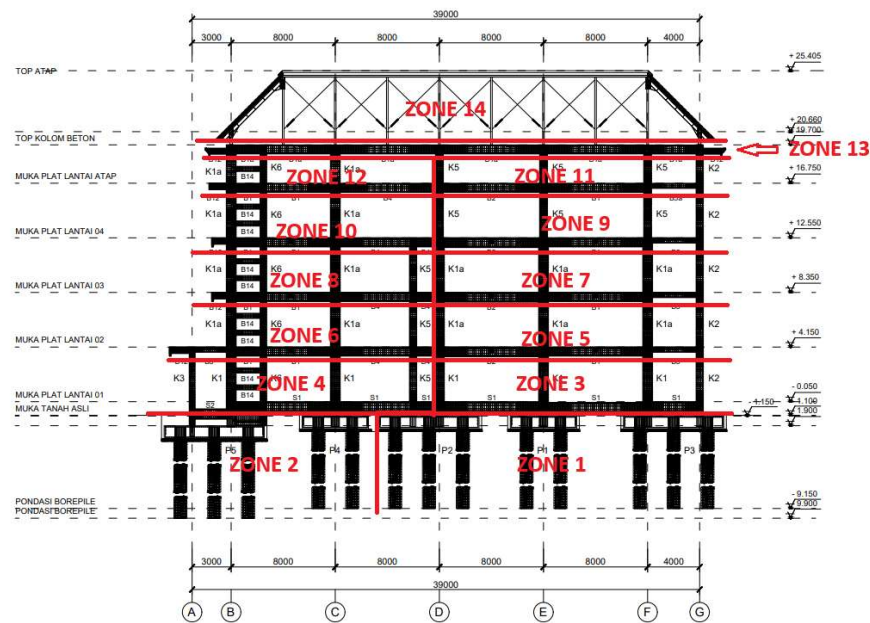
24 Zoning Plan Showing Two-Zone Parallel Arrangement per Floor
